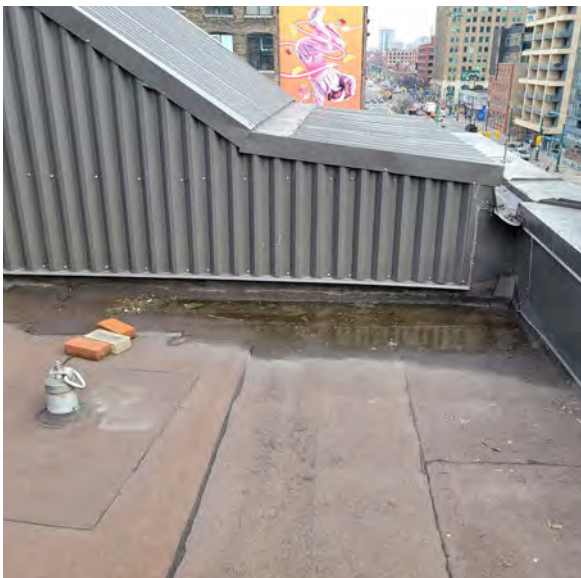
Steel anchor point and water pooling (ERA, 2022).
